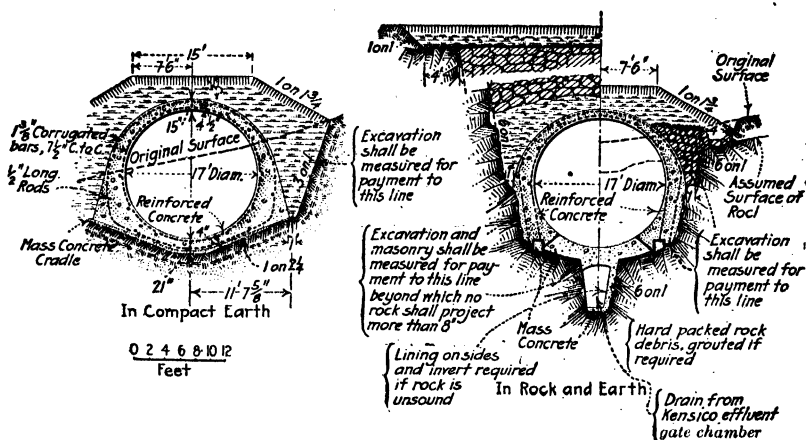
Reinforced concrete aqueduct. Types in open cut.
